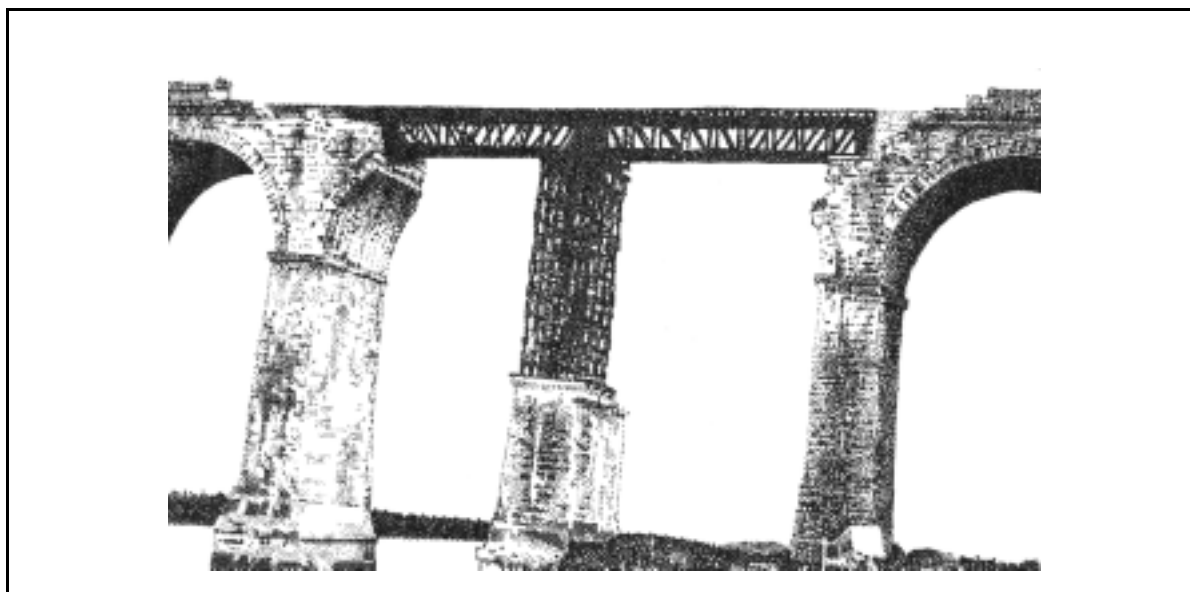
Bailey Panels Over a Broken Masonry Arch
